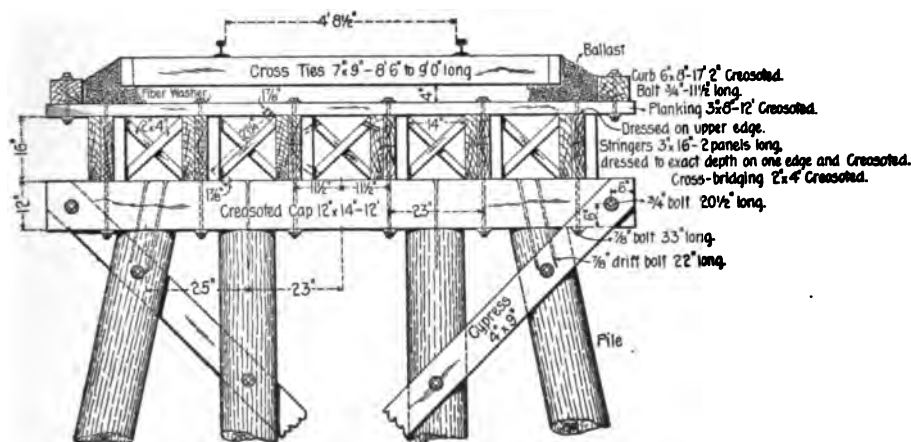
Cross-section of Pile Trestle with Ballast Floor.
